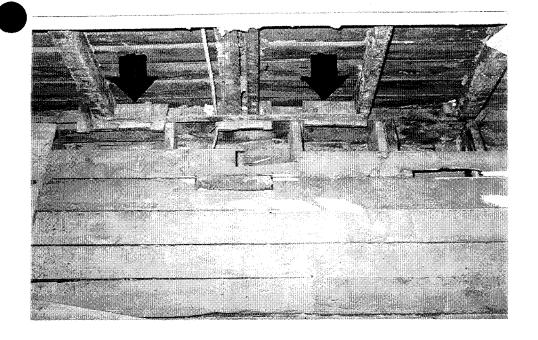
SOUTH-WEST PORCH FLOOR BOARDS
